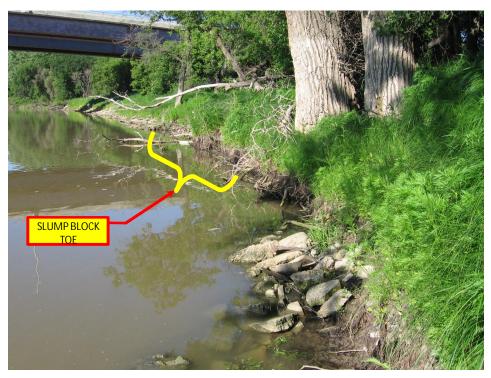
Toe erosion and toe of slump block upstream (south) of pipe crossing alignment. Photograph taken from pipe crossing.
